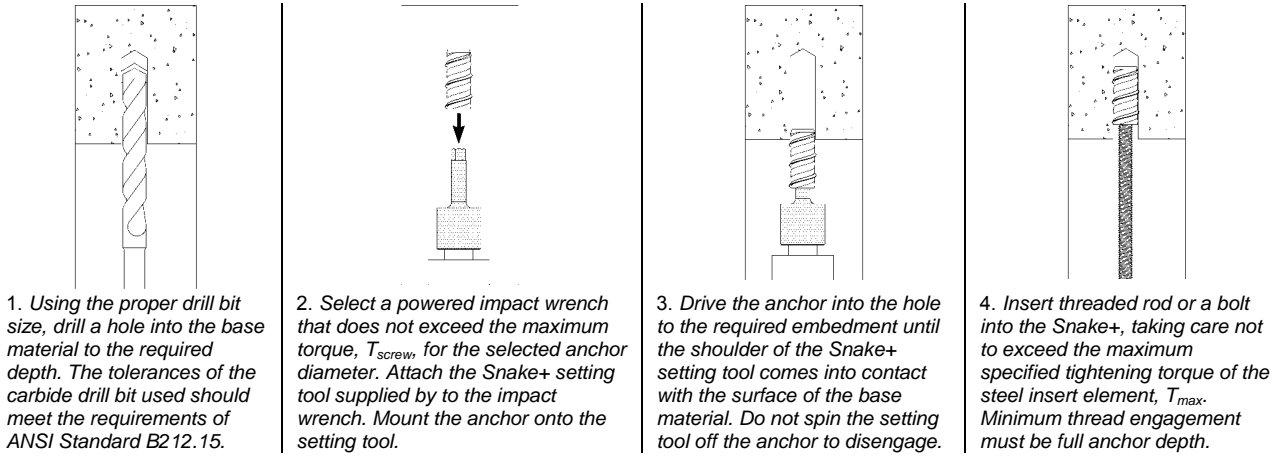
SNAKE+ SCREW ANCHOR INSTALLATION INSTRUCTIONS
